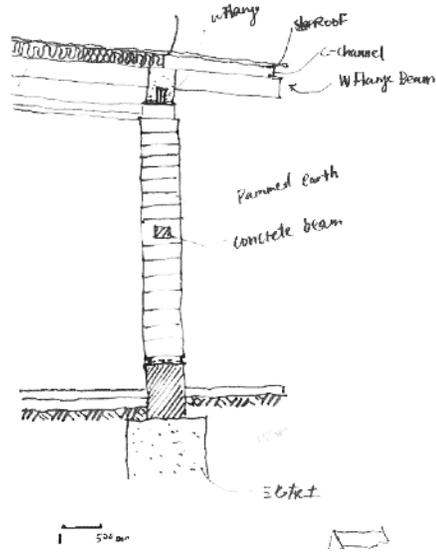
an adaptive masonry wall using tamped earth and hidden steel structure
